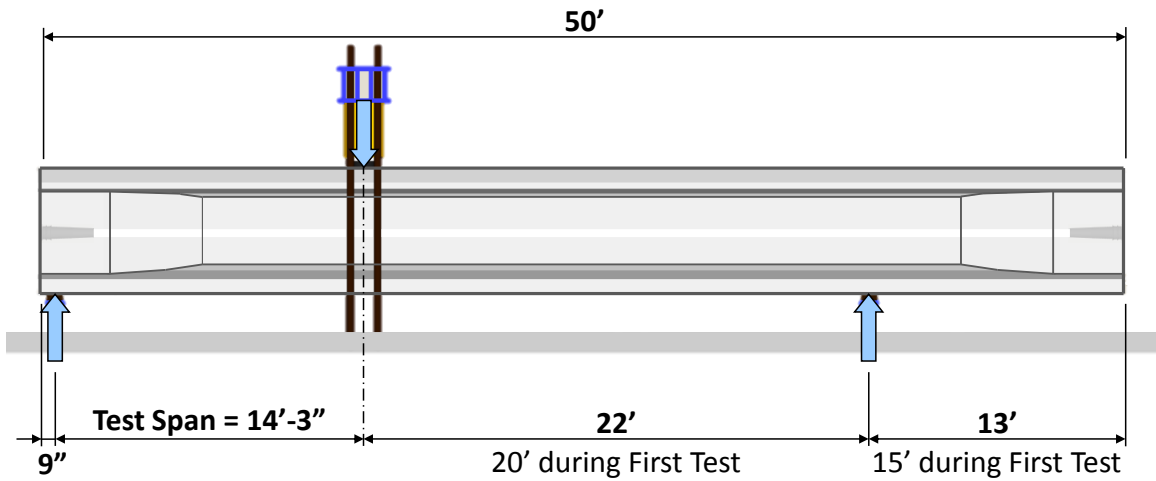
Loading configuration for the I-girder tests of the first phase of the spliced girder research program
